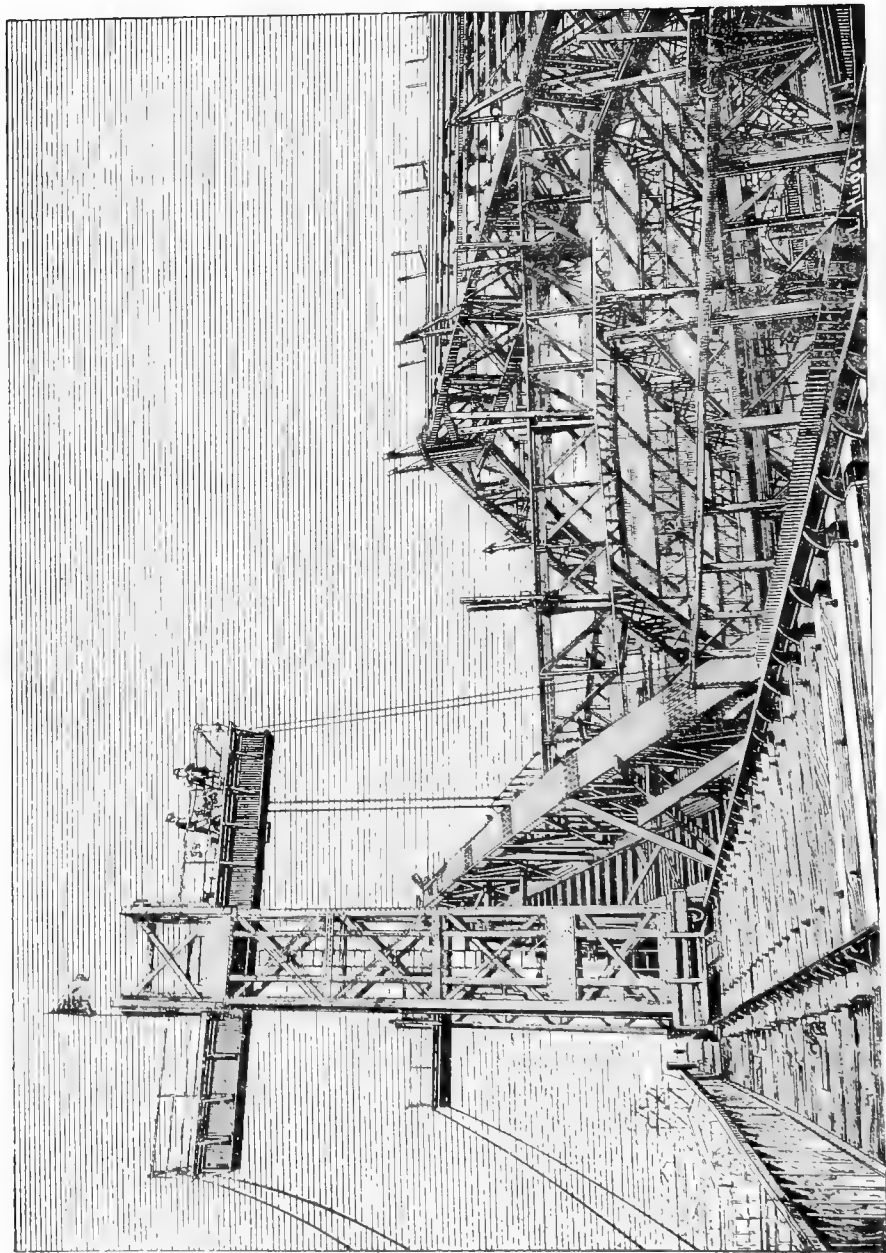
Erection of the great truss girders. Method used by Call & Co. One of the upper platforms of the rolling scaffolding.
